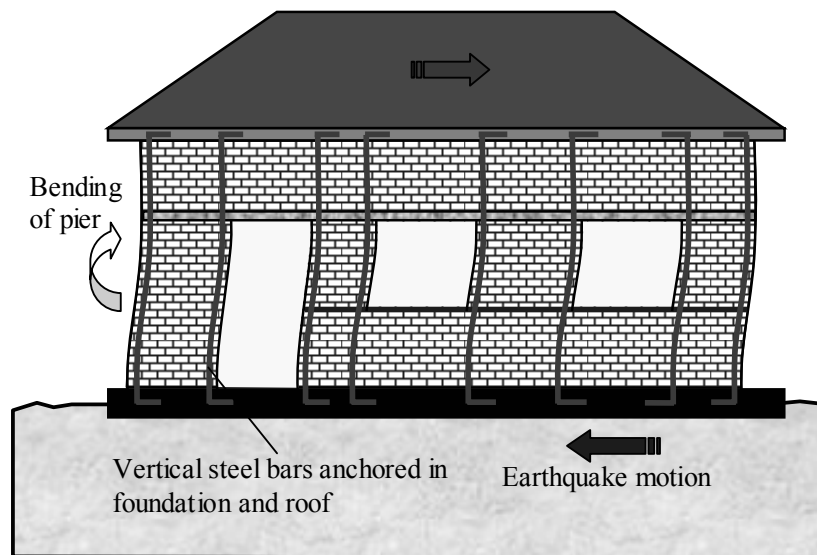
Provision of horizontal and vertical bars during earthquake (Ref. 0.16)
